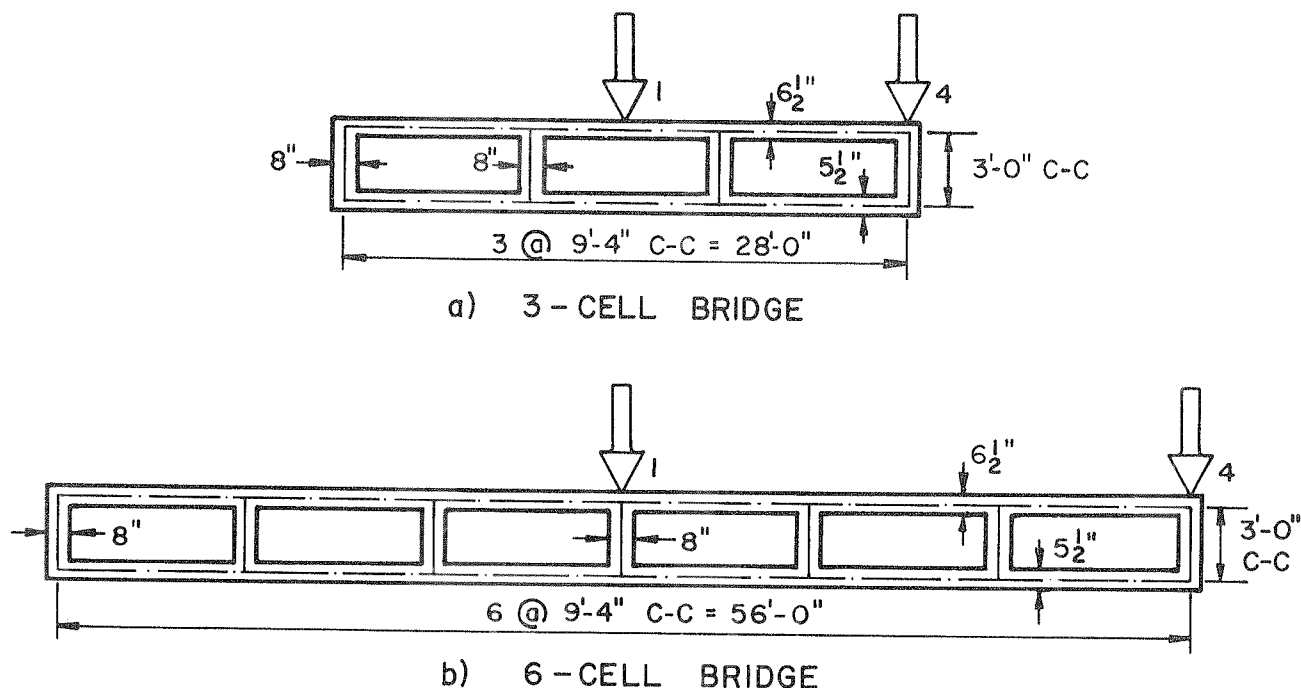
TRANSVERSE SECTION DIMENSIONS AND LOAD POSITIONS FOR EXAMPLE BRIDGES
